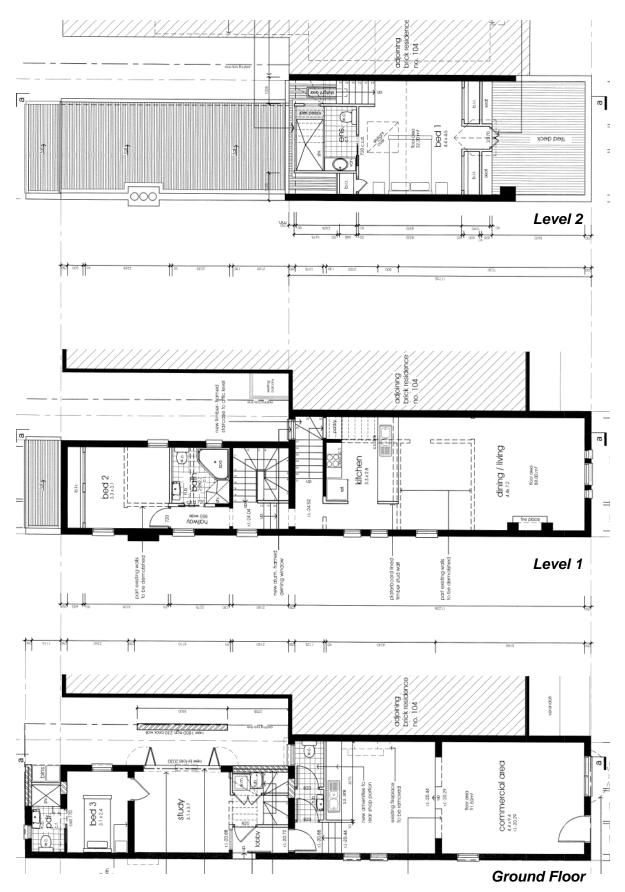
Floor plans for 106 Pitt Street Redfern (source: D/2006/1159)
